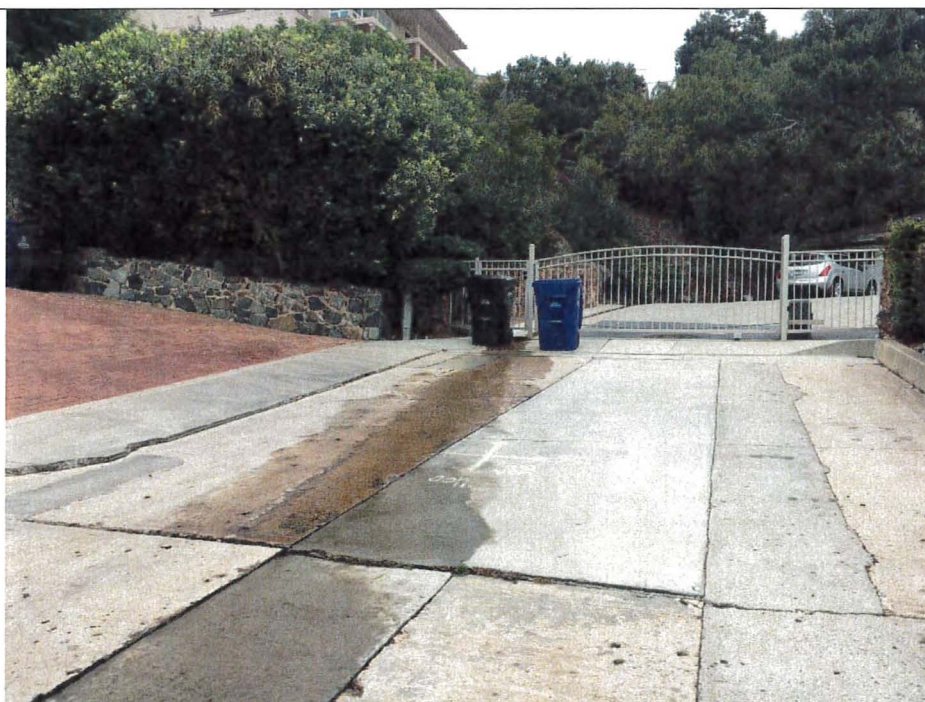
Continuation of urban runoff onto Tavera Place, facing north.
